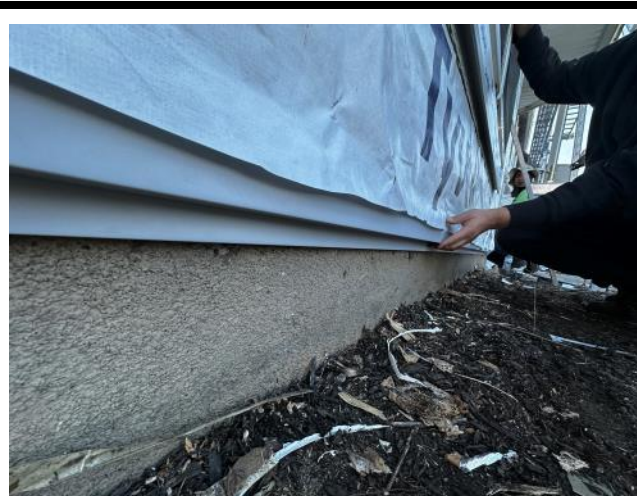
Overview of new metal flashing being installed before installing the starter strip.
